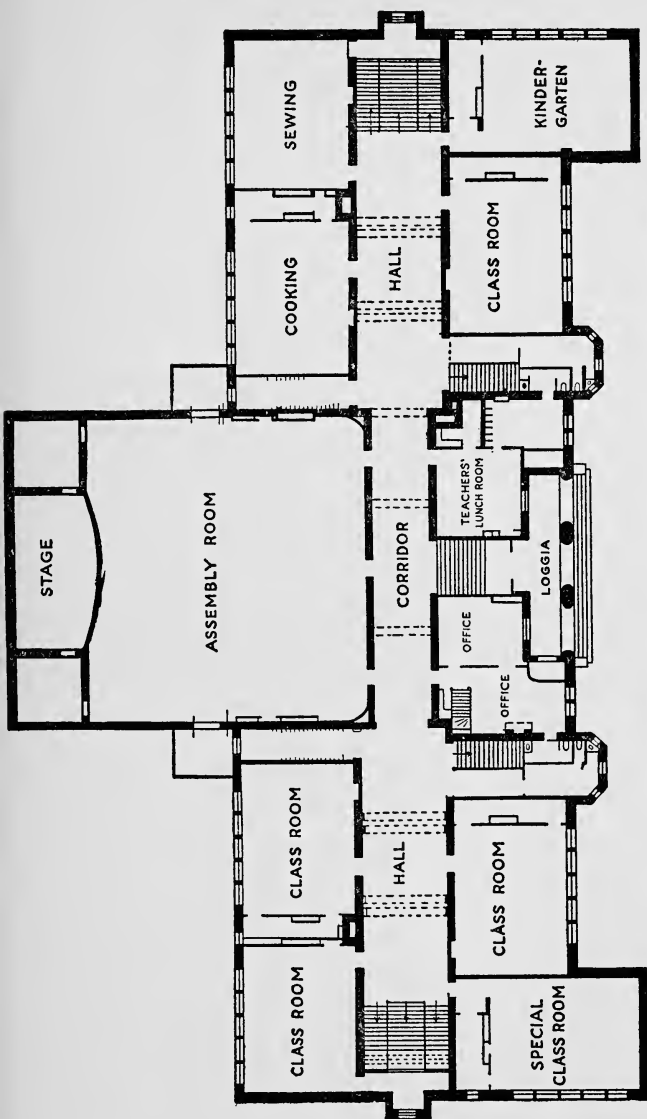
FIRST-FLOOR PLAN OF A SUGGESTED TYPE OF SCHOOLHOUSE
